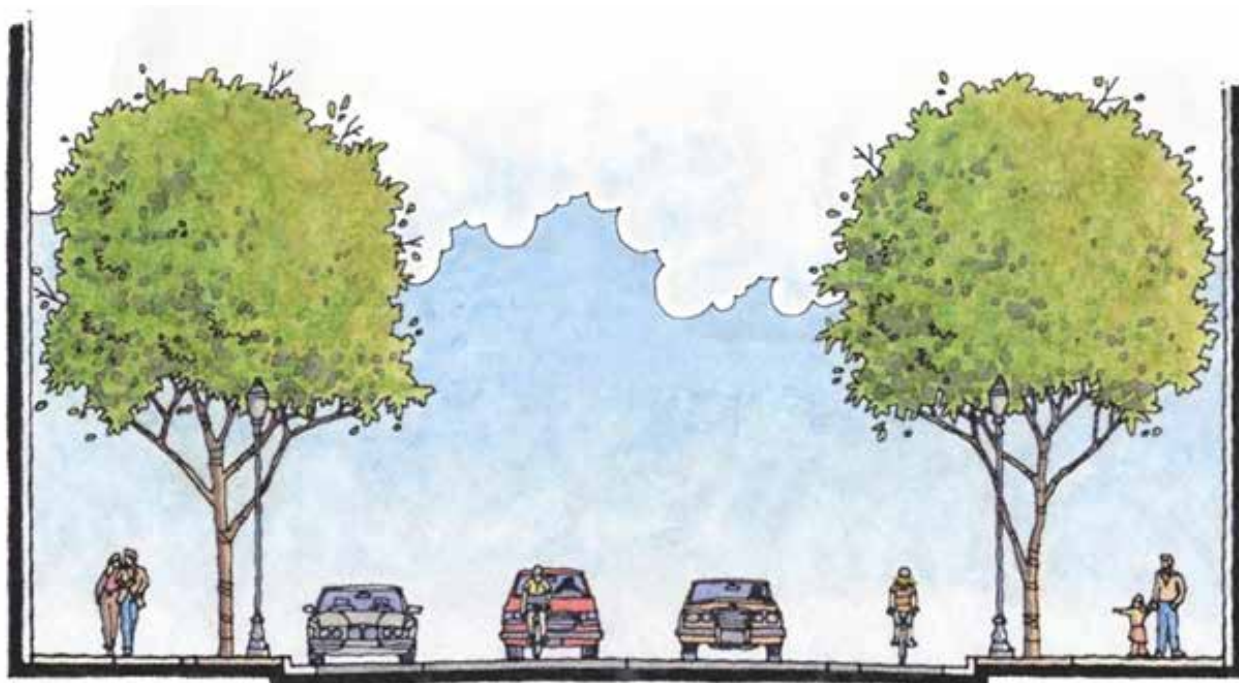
Wilson Street Cross Section with Parking on Street's North Side, Westbound Sharrows, and Eastbound Cycle Track
